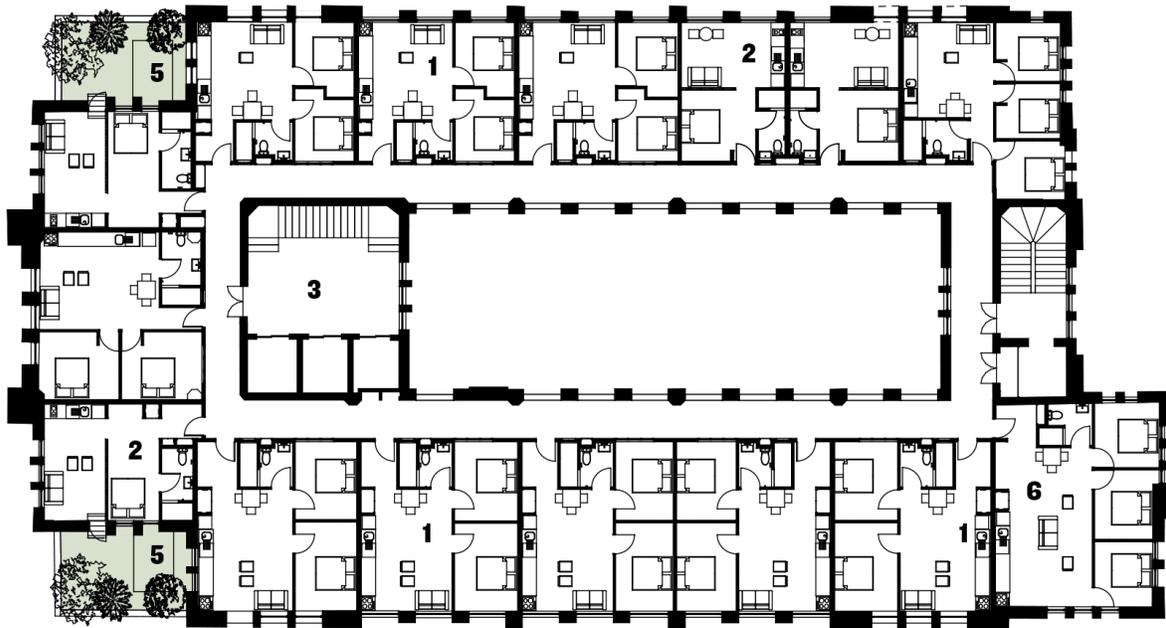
illustrating The Third Floor Plan of the Pixley House's location (Source: <https://www.google.co.za>)
